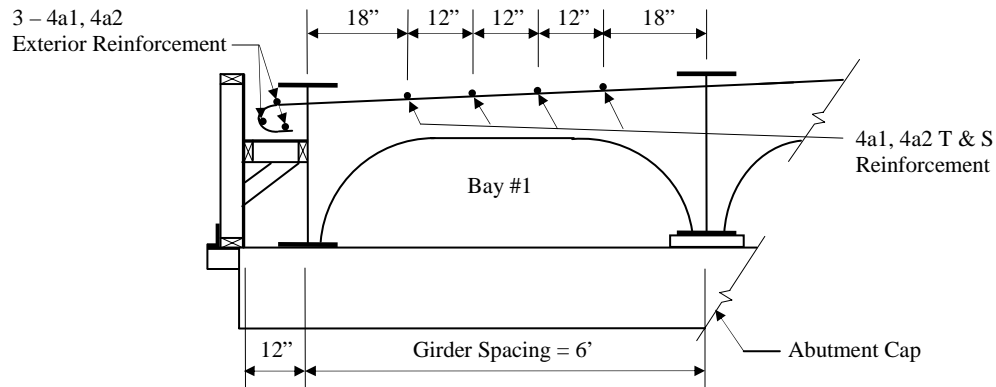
Typical layout of the longitudinal T & S reinforcement.
